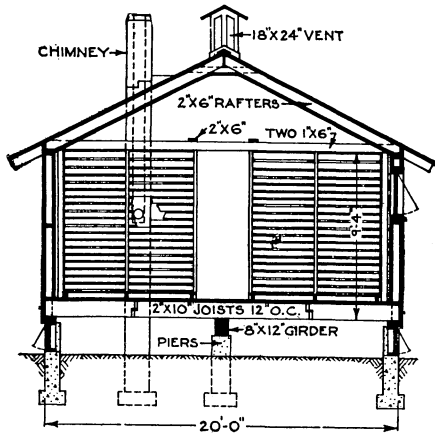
Section through a sweetpotato storage house, size 20 by 40 feet, having a capacity of 2,000 bushels in crates or 2,500 bushels in bulk, showing structural details. If the sweetpotatoes are to be stored in crates, the height should be changed to 12 feet 4 inches for the same capacity. If the house is used for bin storage, the sweetpotatoes should be loaded not over 6 feet high.
